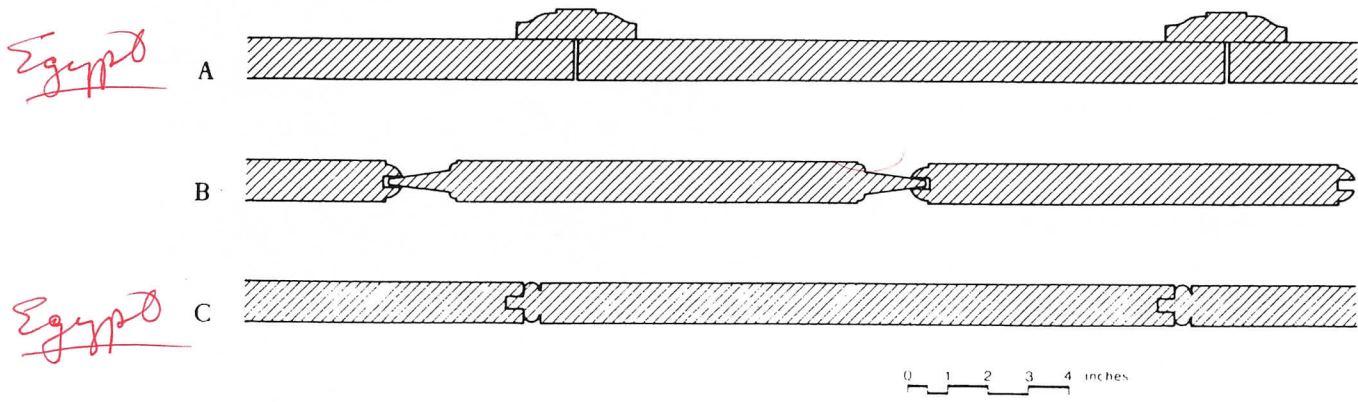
Interior partition details: a, between first-floor rear rooms at Fort Egypt; b, second-floor partition at Fort Stover; c, between the Stube and Kammer at Fort Egypt.
